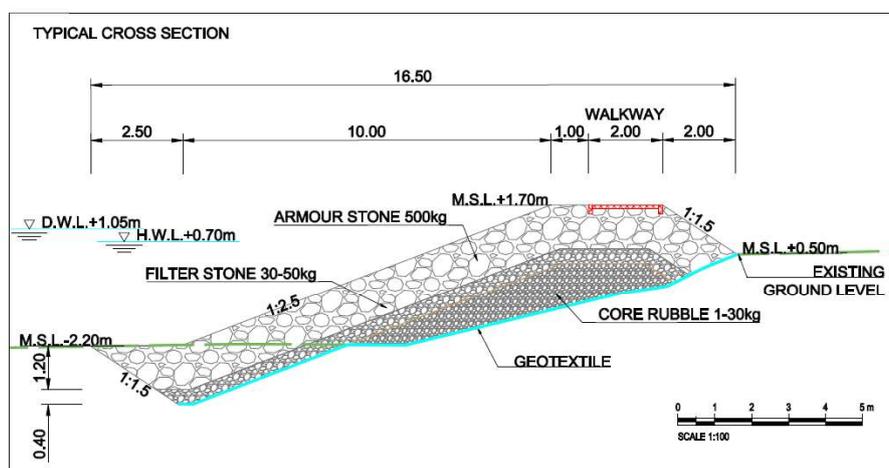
Typical Cross Section of Nourishment at Fonadhoo
